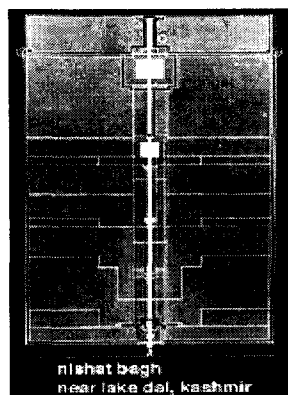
Plan of Nishat Bagh Gardens in Kashmir.
